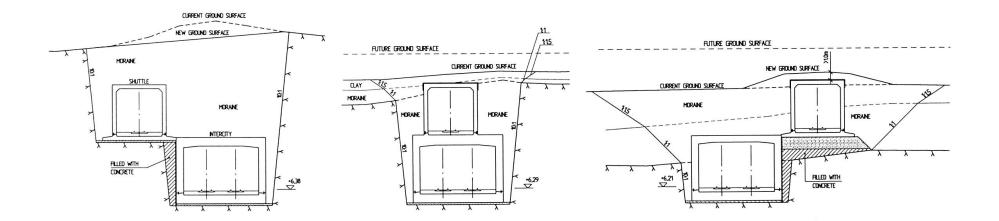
Over-crossing concrete tunnels at Märstaån in Arlandabanan
